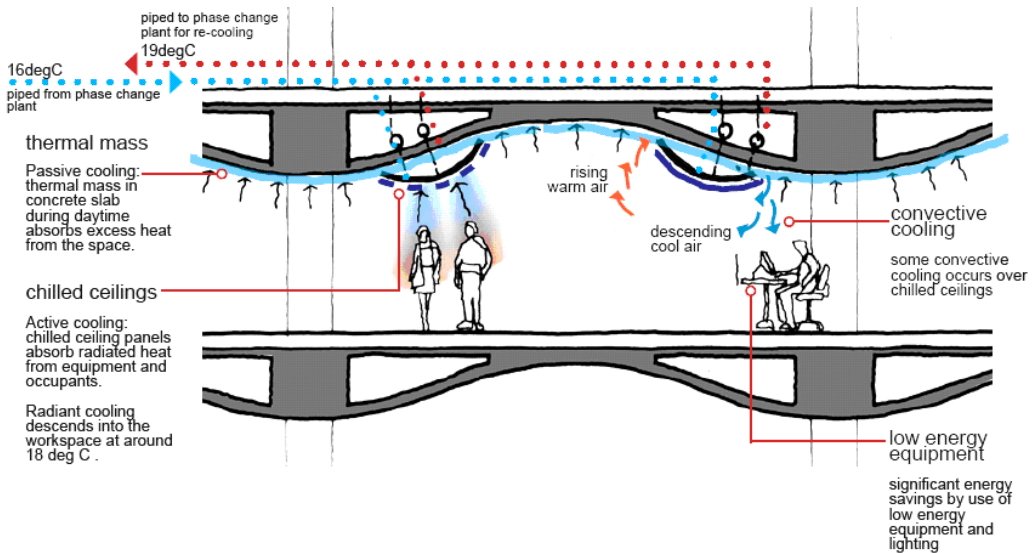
Chilled ceiling panels placed onto the ceilings¹⁰
